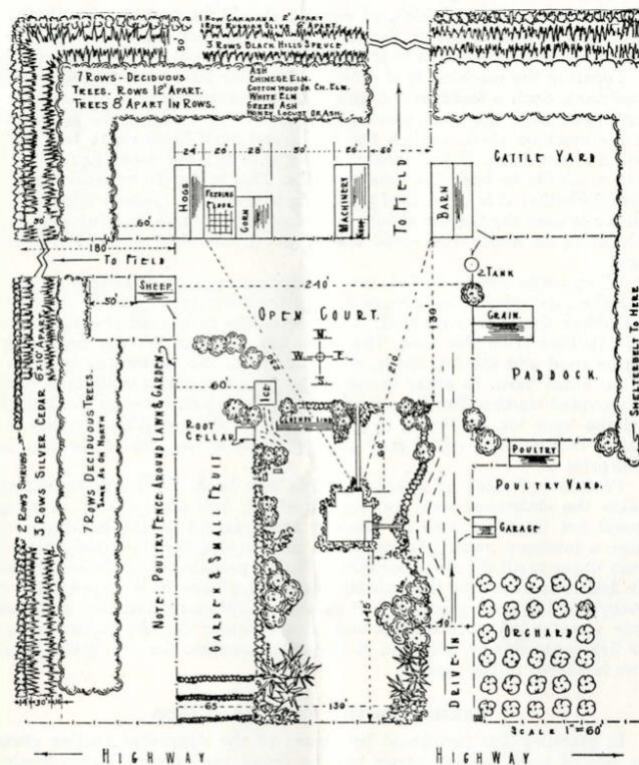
THE COMPLETED FARMSTEAD PLAN
